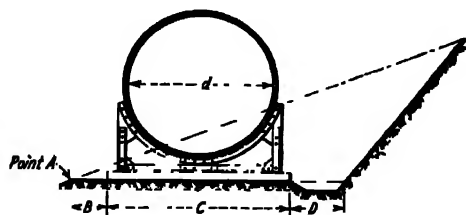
Typical side-hill cut for a bench for wood-stave pipe.
